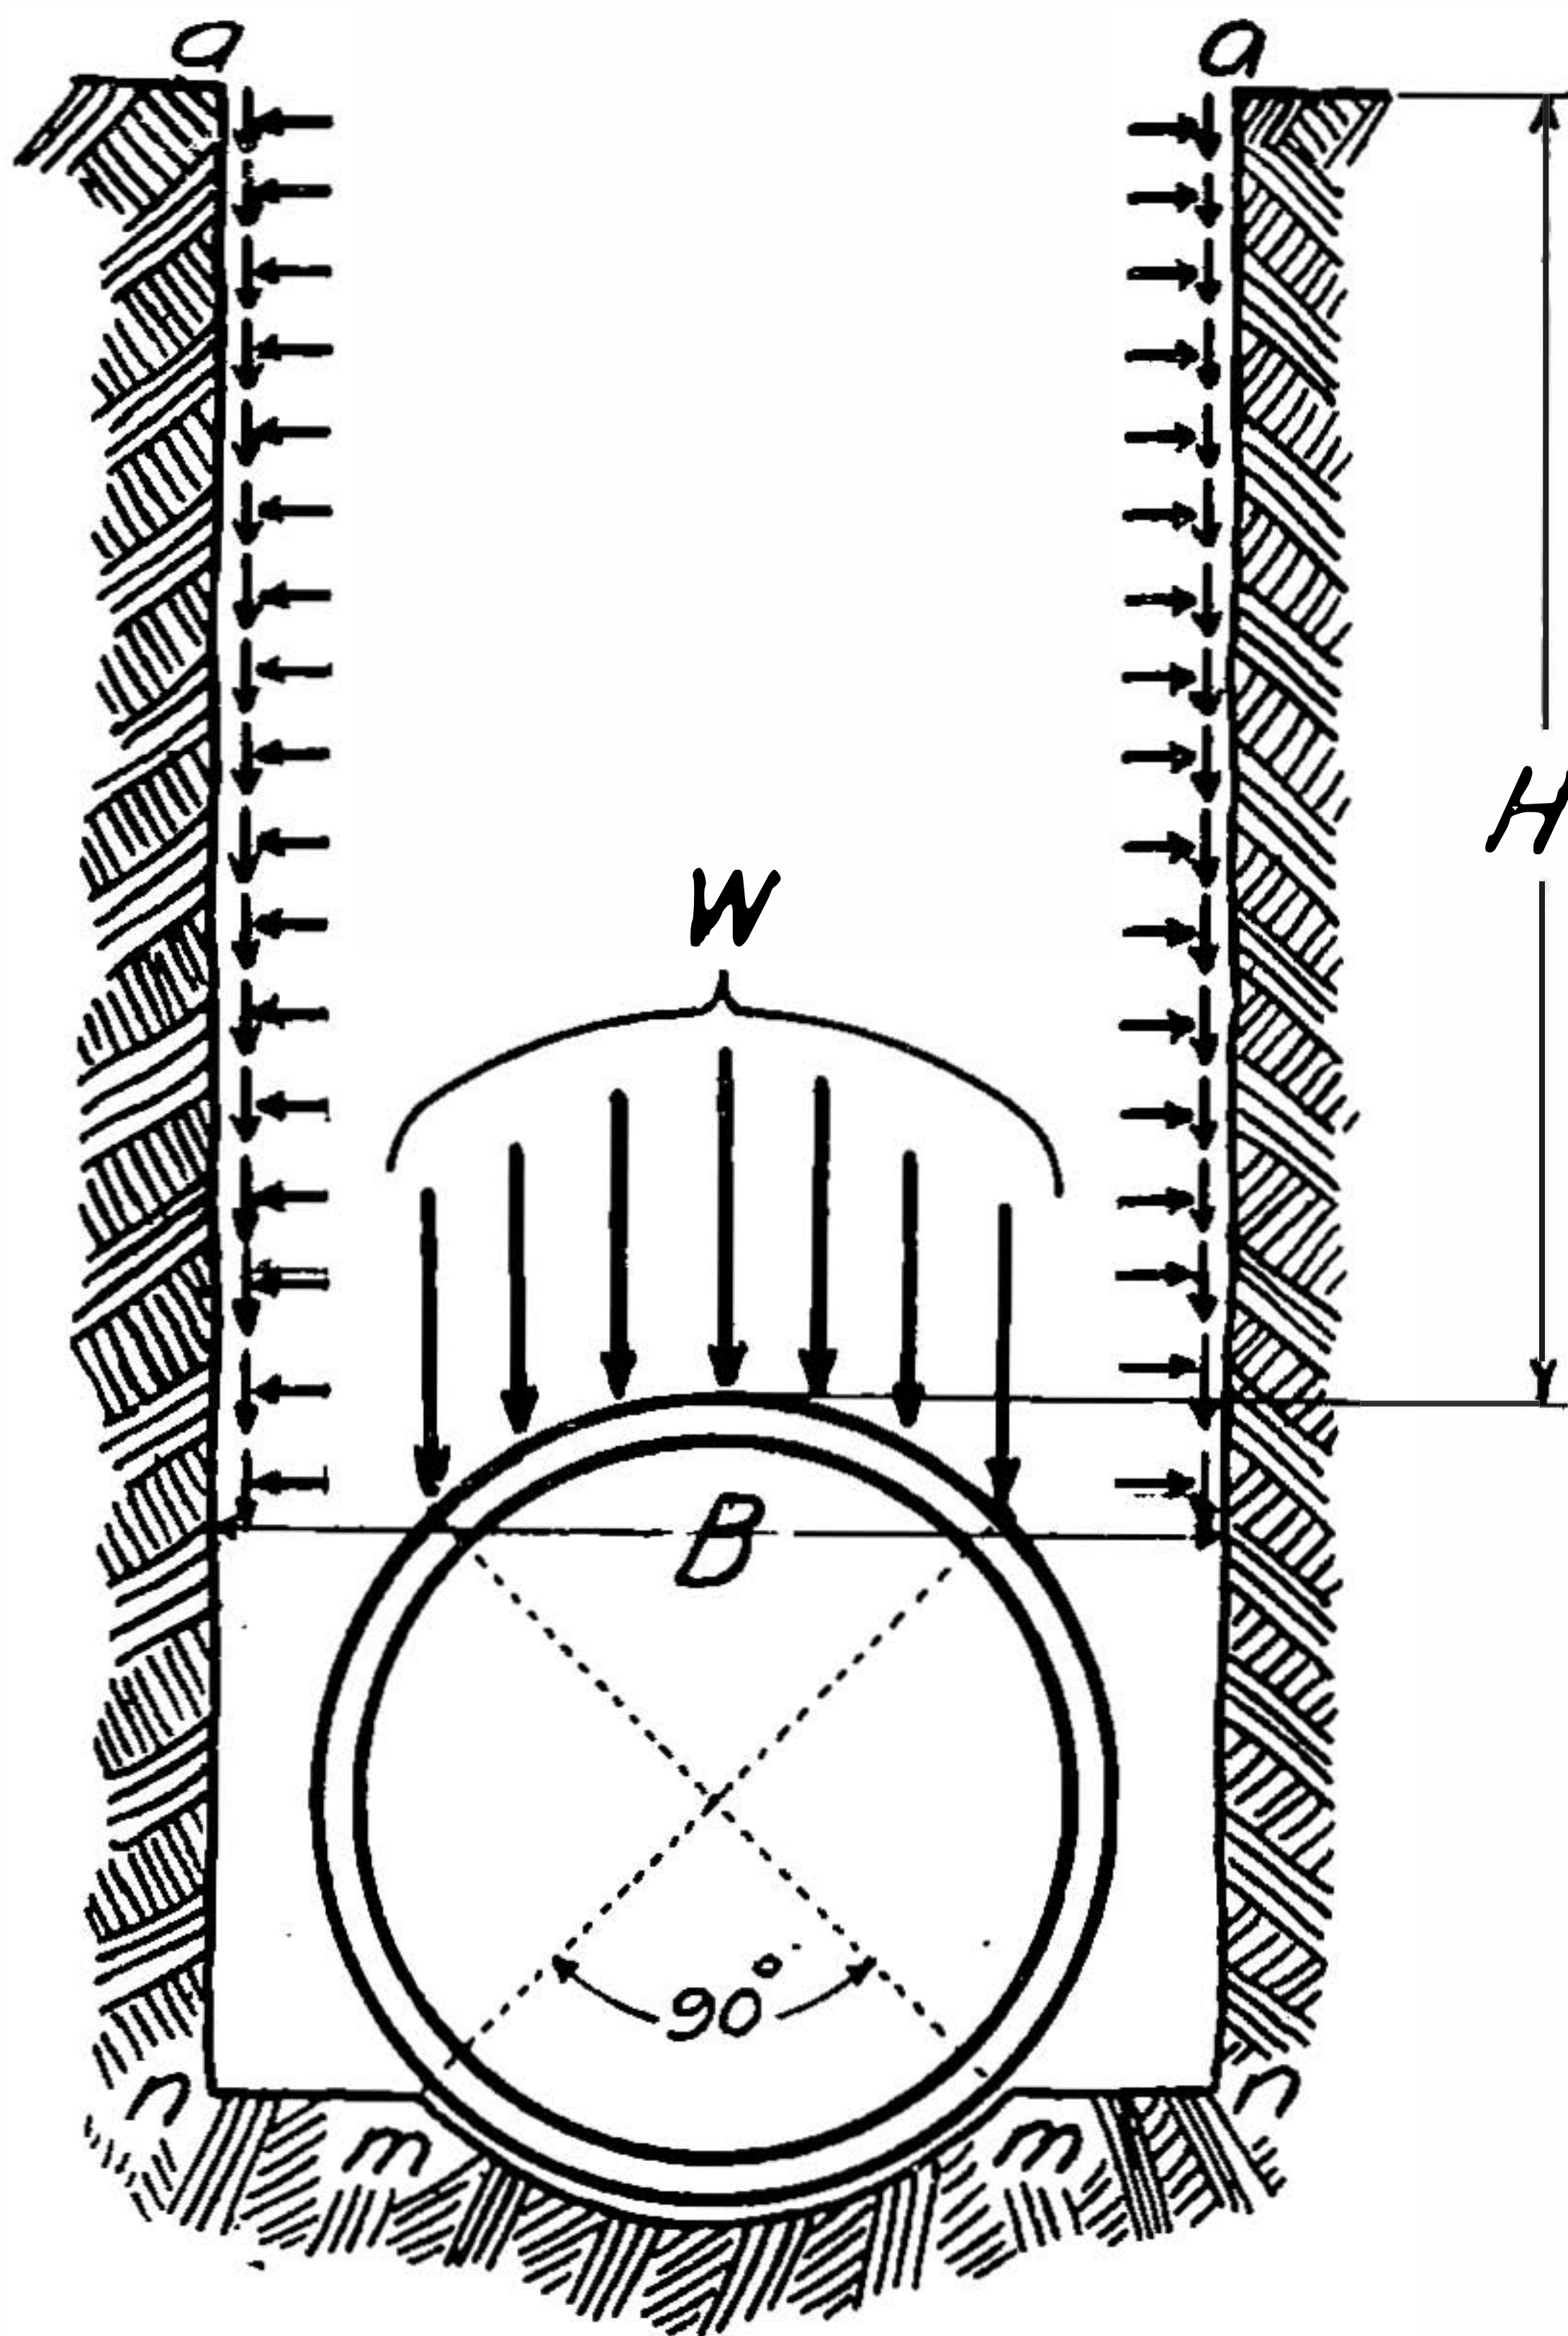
Typical Conditions of Bedding and Loading of Pipe in Ditches.
